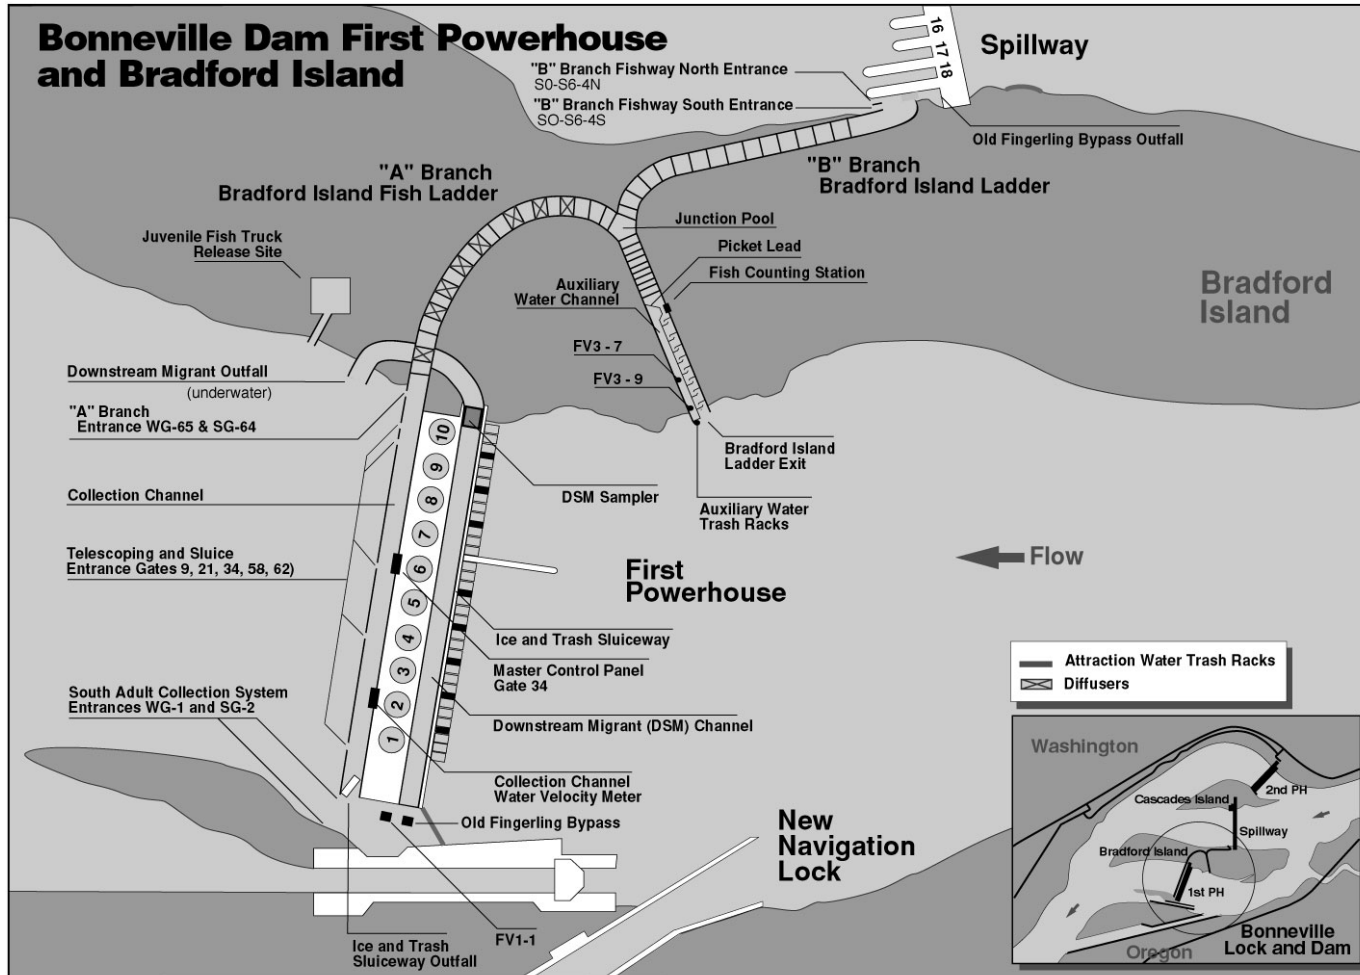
Bonneville Dam first powerhouse and Bradford Island fish ladder.
